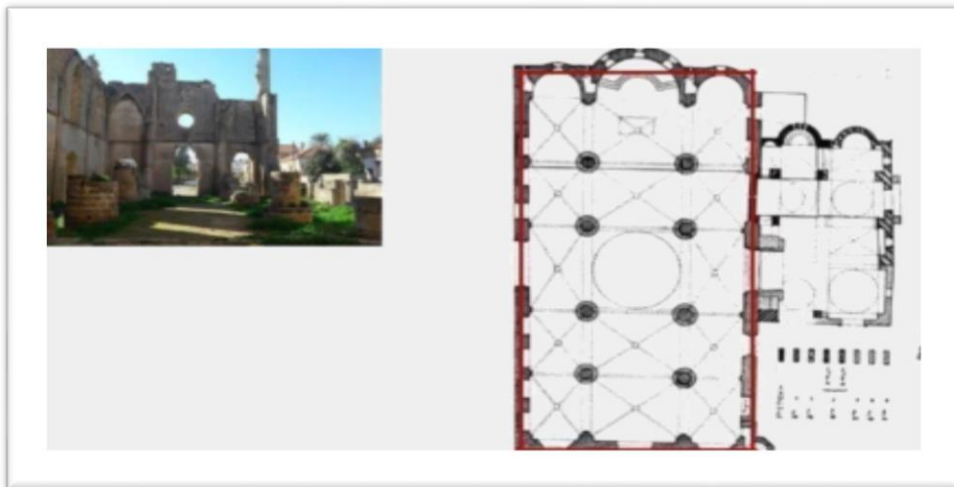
Site plan's sketch /for identifying the site features the past (I'Anson, 1883, Pirlanta,2014)
